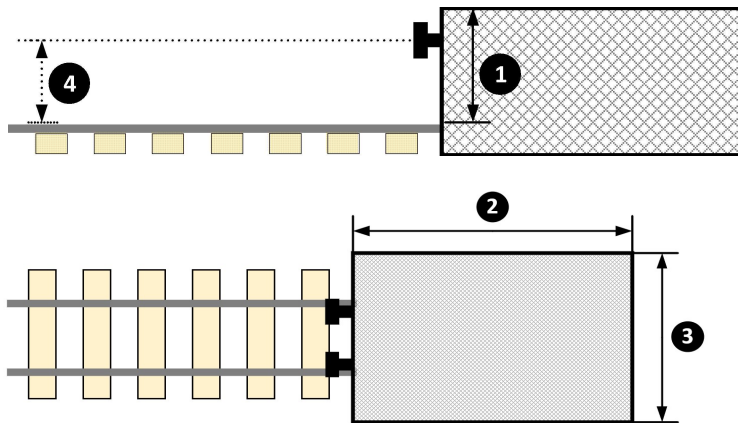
HEAD RAMP WITH MAIN DIMENSIONS
